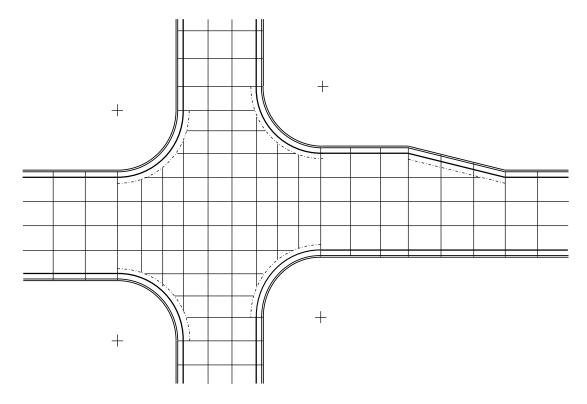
Typical Joint Layout for a Rigid Pavement Intersection (Shows Lane Configuration, Step 9)
